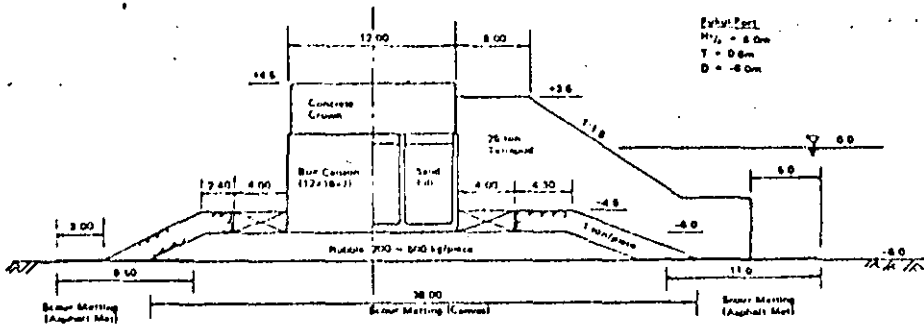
Example of Scour Matting (North Breakwater of Fukui Port)
